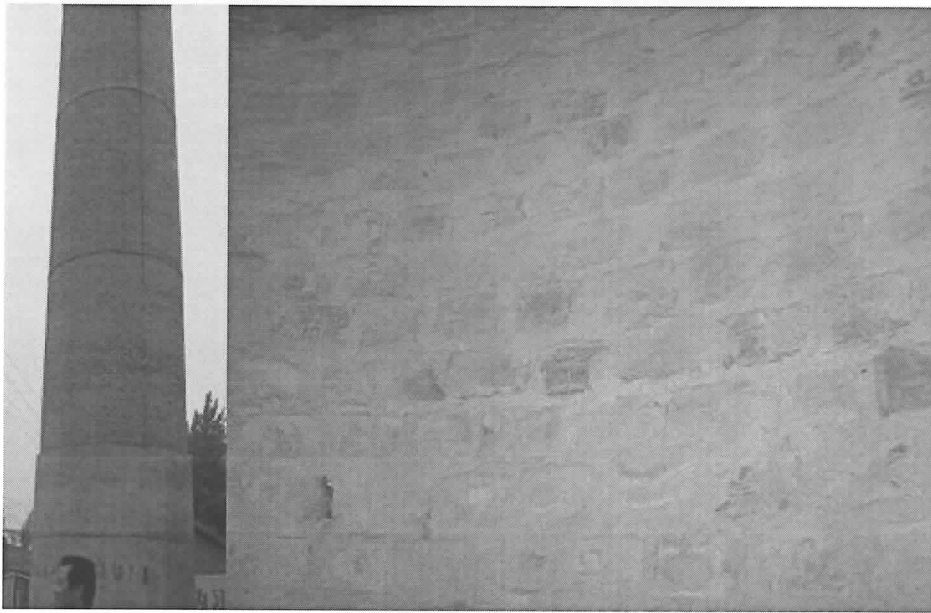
Masonry structure tower with ring beams, mortar strength is reduced along the height. Circumferential cracks appear at the section of the mortar strength has changed.
